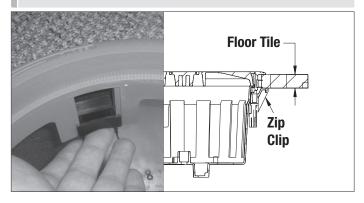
ZIP CLIP ADAPTER FOR ALUMINUM MOUNTING RINGS
